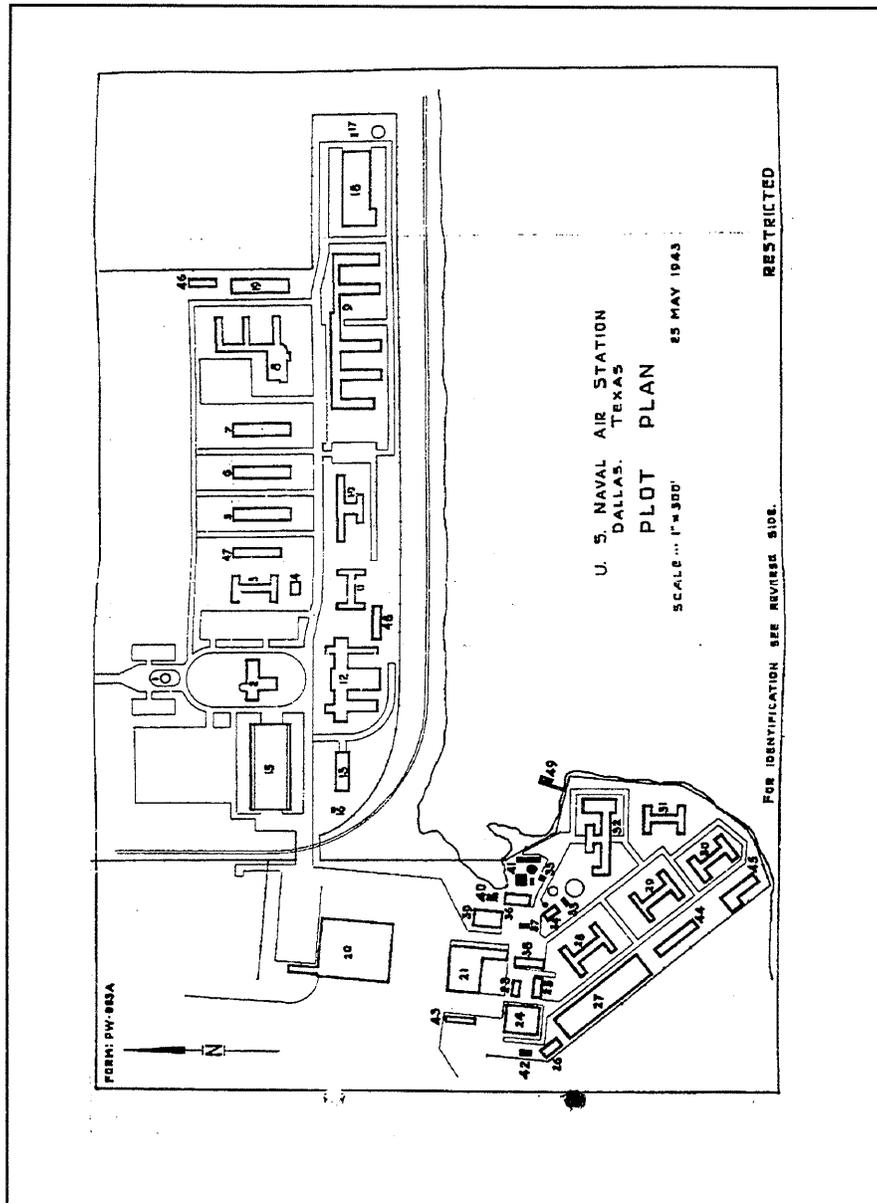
Plot Plan, Naval Air Station Dallas, May 1943 (Source: Public Affairs Office, NAS Dallas)
